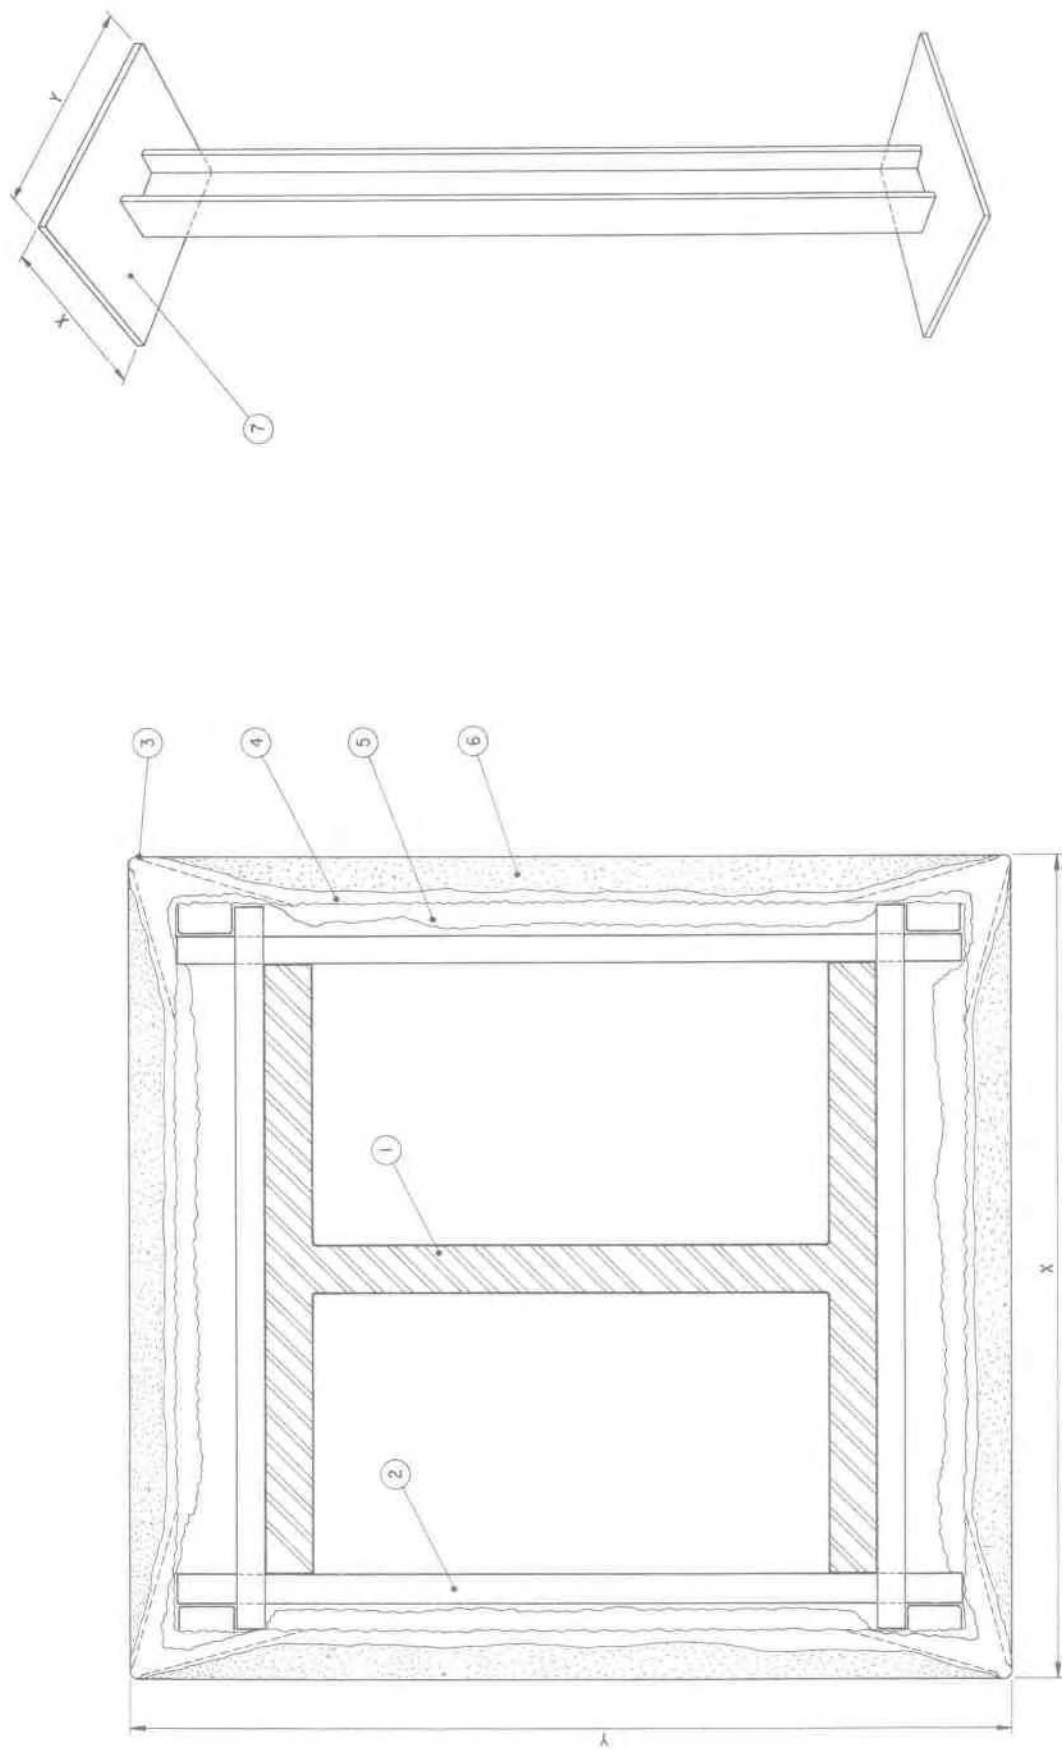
CONSTRUCTION DETAILS OF TYPICAL SPECIMEN
